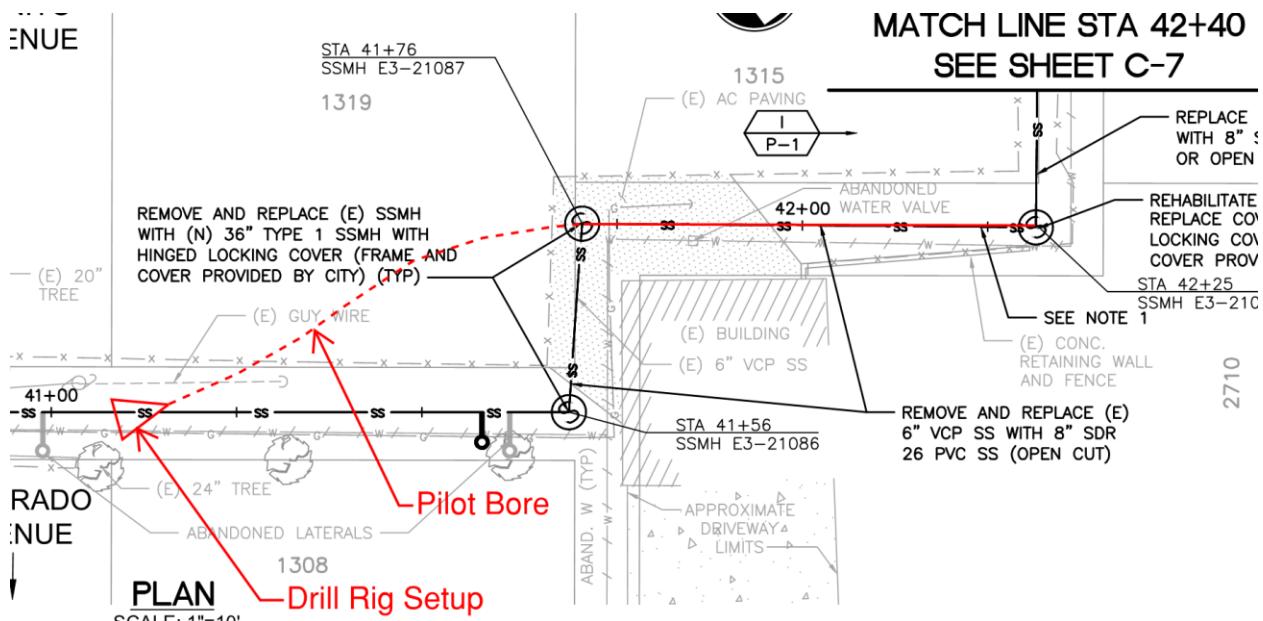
Pipe reaming equipment setup utilizing a pilot bore.
